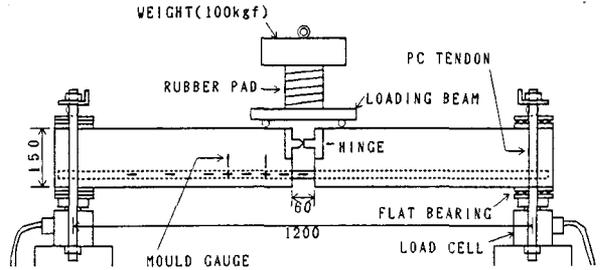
SPECIMEN DETAILS & IMPACT TEST SET-UP
